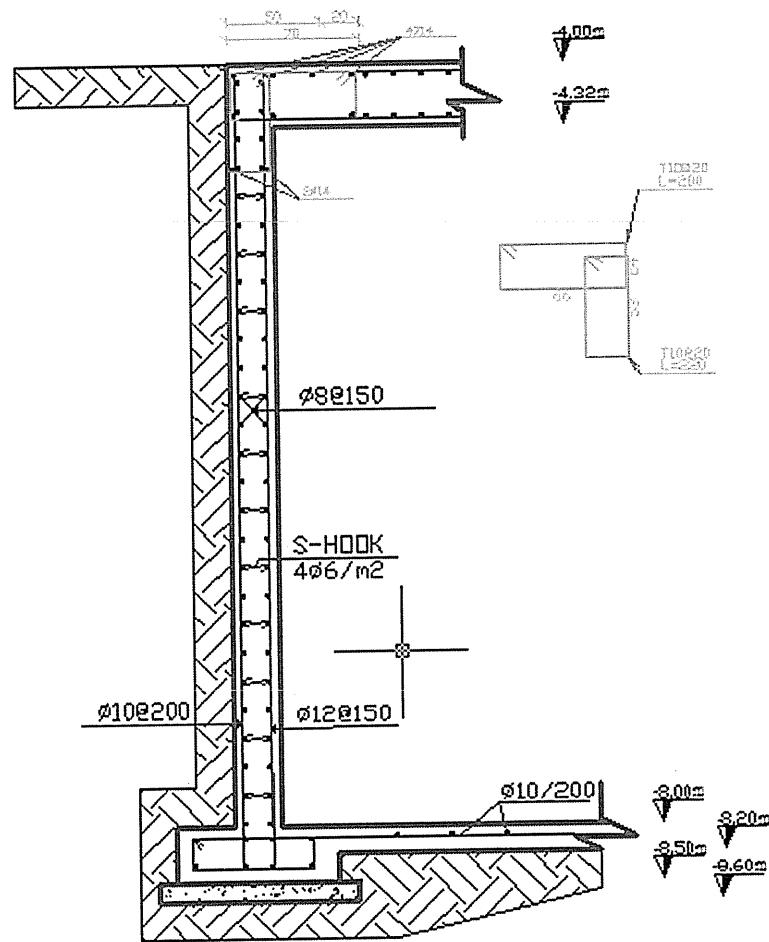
Reinforcement Detail of Basement Wall (BW1)
